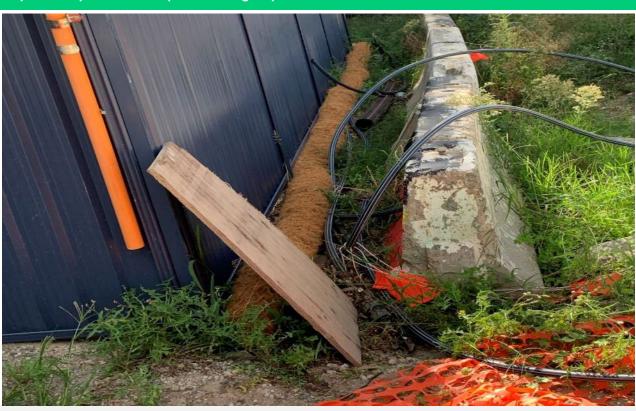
Para web fencing installed at Sediment Ponds. Refer to site observations regarding controls.
